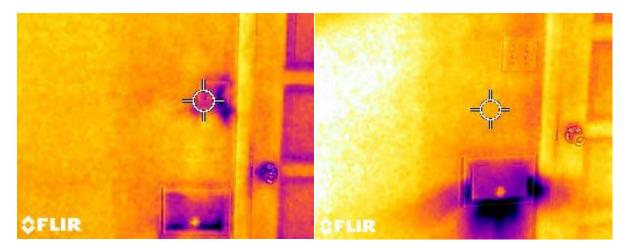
Exterior wall light switch leakage reduced from before (left) to after sealing (right). Mailbox in lower portion of image was purposely not sealed
